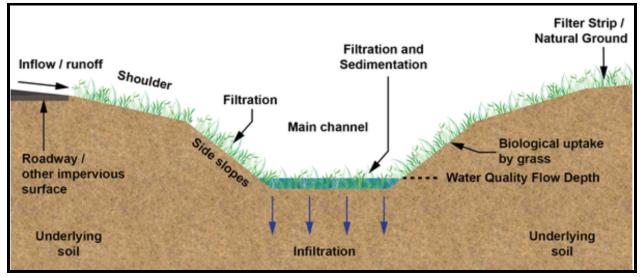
Typical cross section of a grass swale and its stormwater treatment process³
